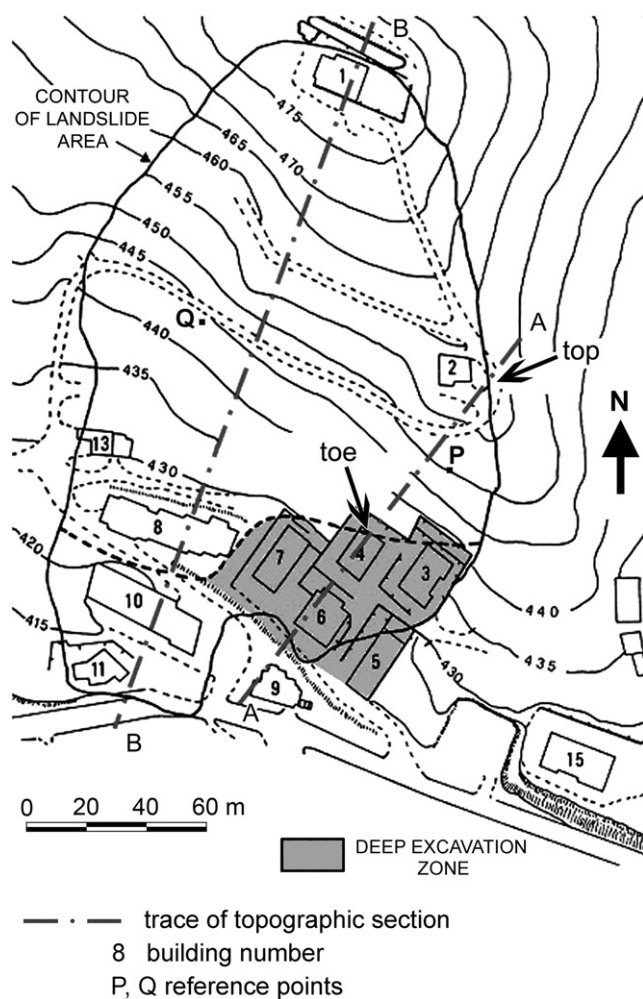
Plan of the landslide with an indication of the buildings involved and the trace of the cross-sections A–A and B–B.
